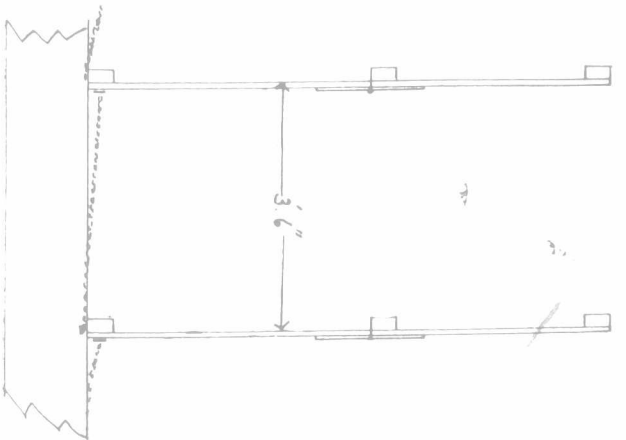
Ground-floor plan of Mr. Wells' cow stall.
